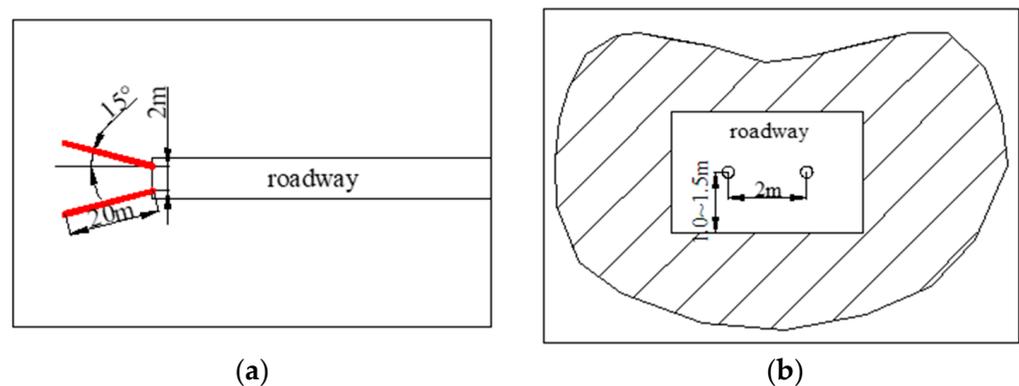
Plan and section of the pressure relief borehole in roadway excavation stage of No.22101 Panel. (a) Plan. (b) Section.
